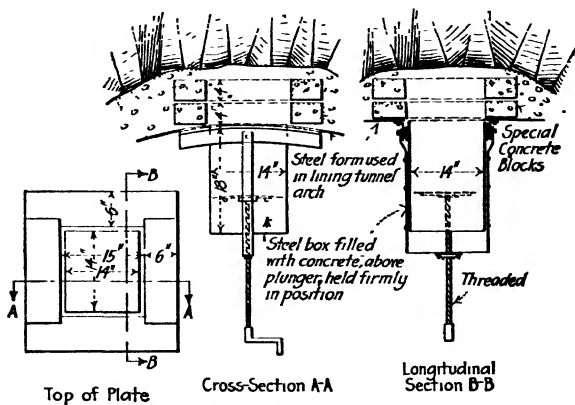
Catskill aqueduct. One method of placing last concrete in key of tunnel arch at a closure.
